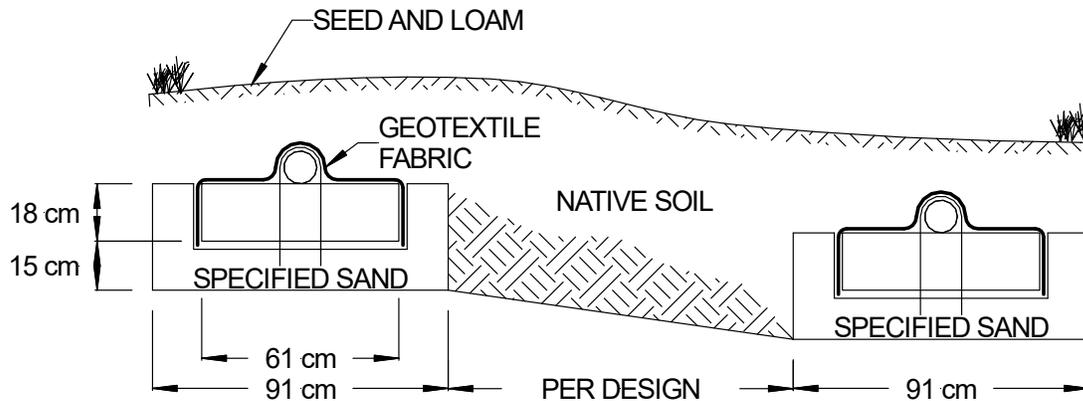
SECTION VIEW – TRENCH SYSTEM – SLOPING SITE
